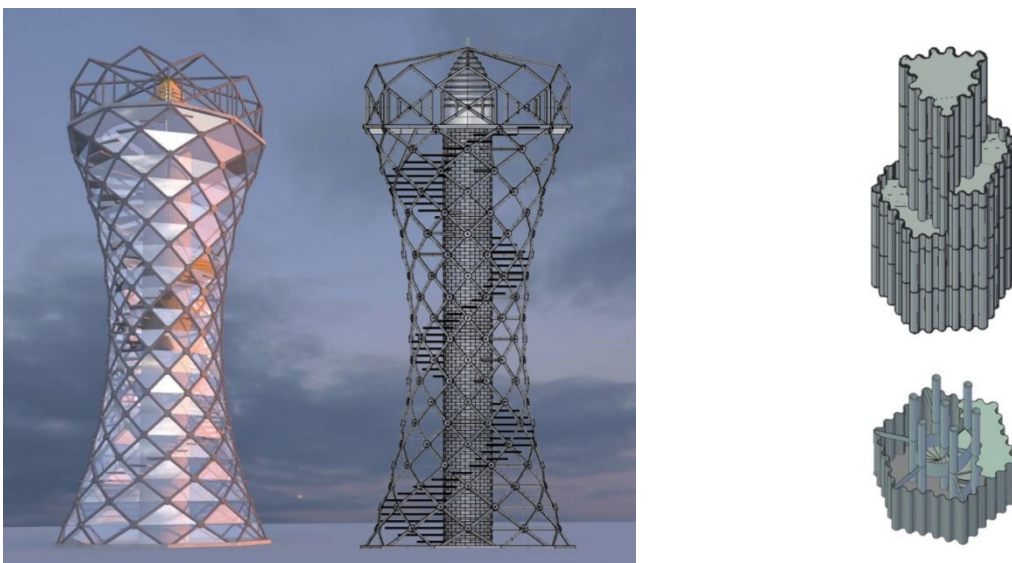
Left: Glass Lighthouse employing glass rod bracings and a cast glass brick core, by P. Peeters and J. Salitrežić. Right: Glass Lighthouse out of a structural corrugated glass façade, hollow tubular columns and waterjet cut float floors, by B. Pompei and R. Nijman.
